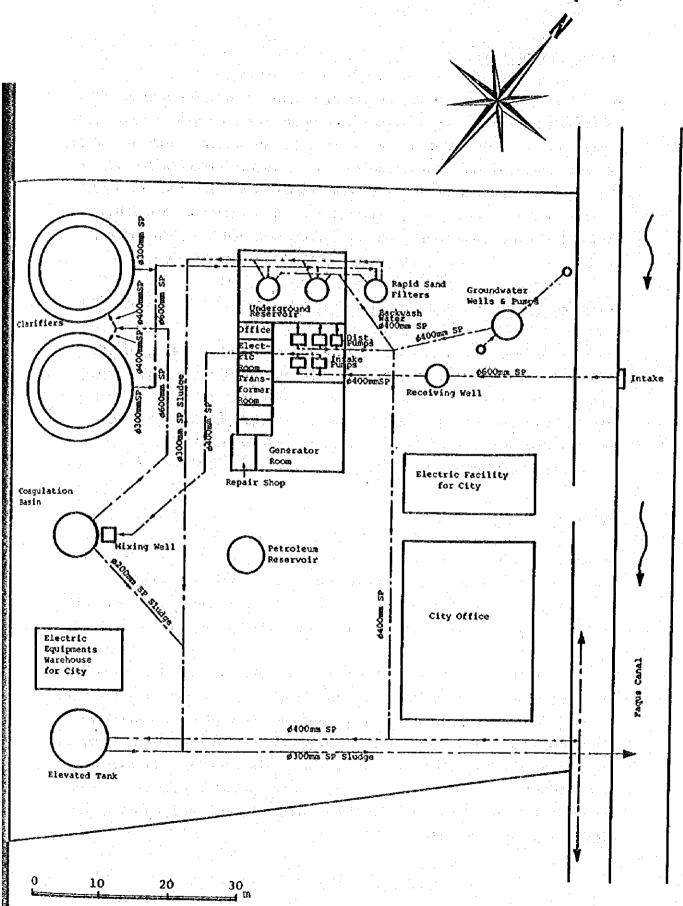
GENERAL PLAN OF FAQUE PLANT
